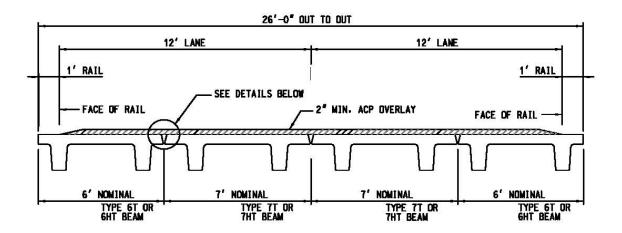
A typical double tee bridge section (FHWA, 2013a)
